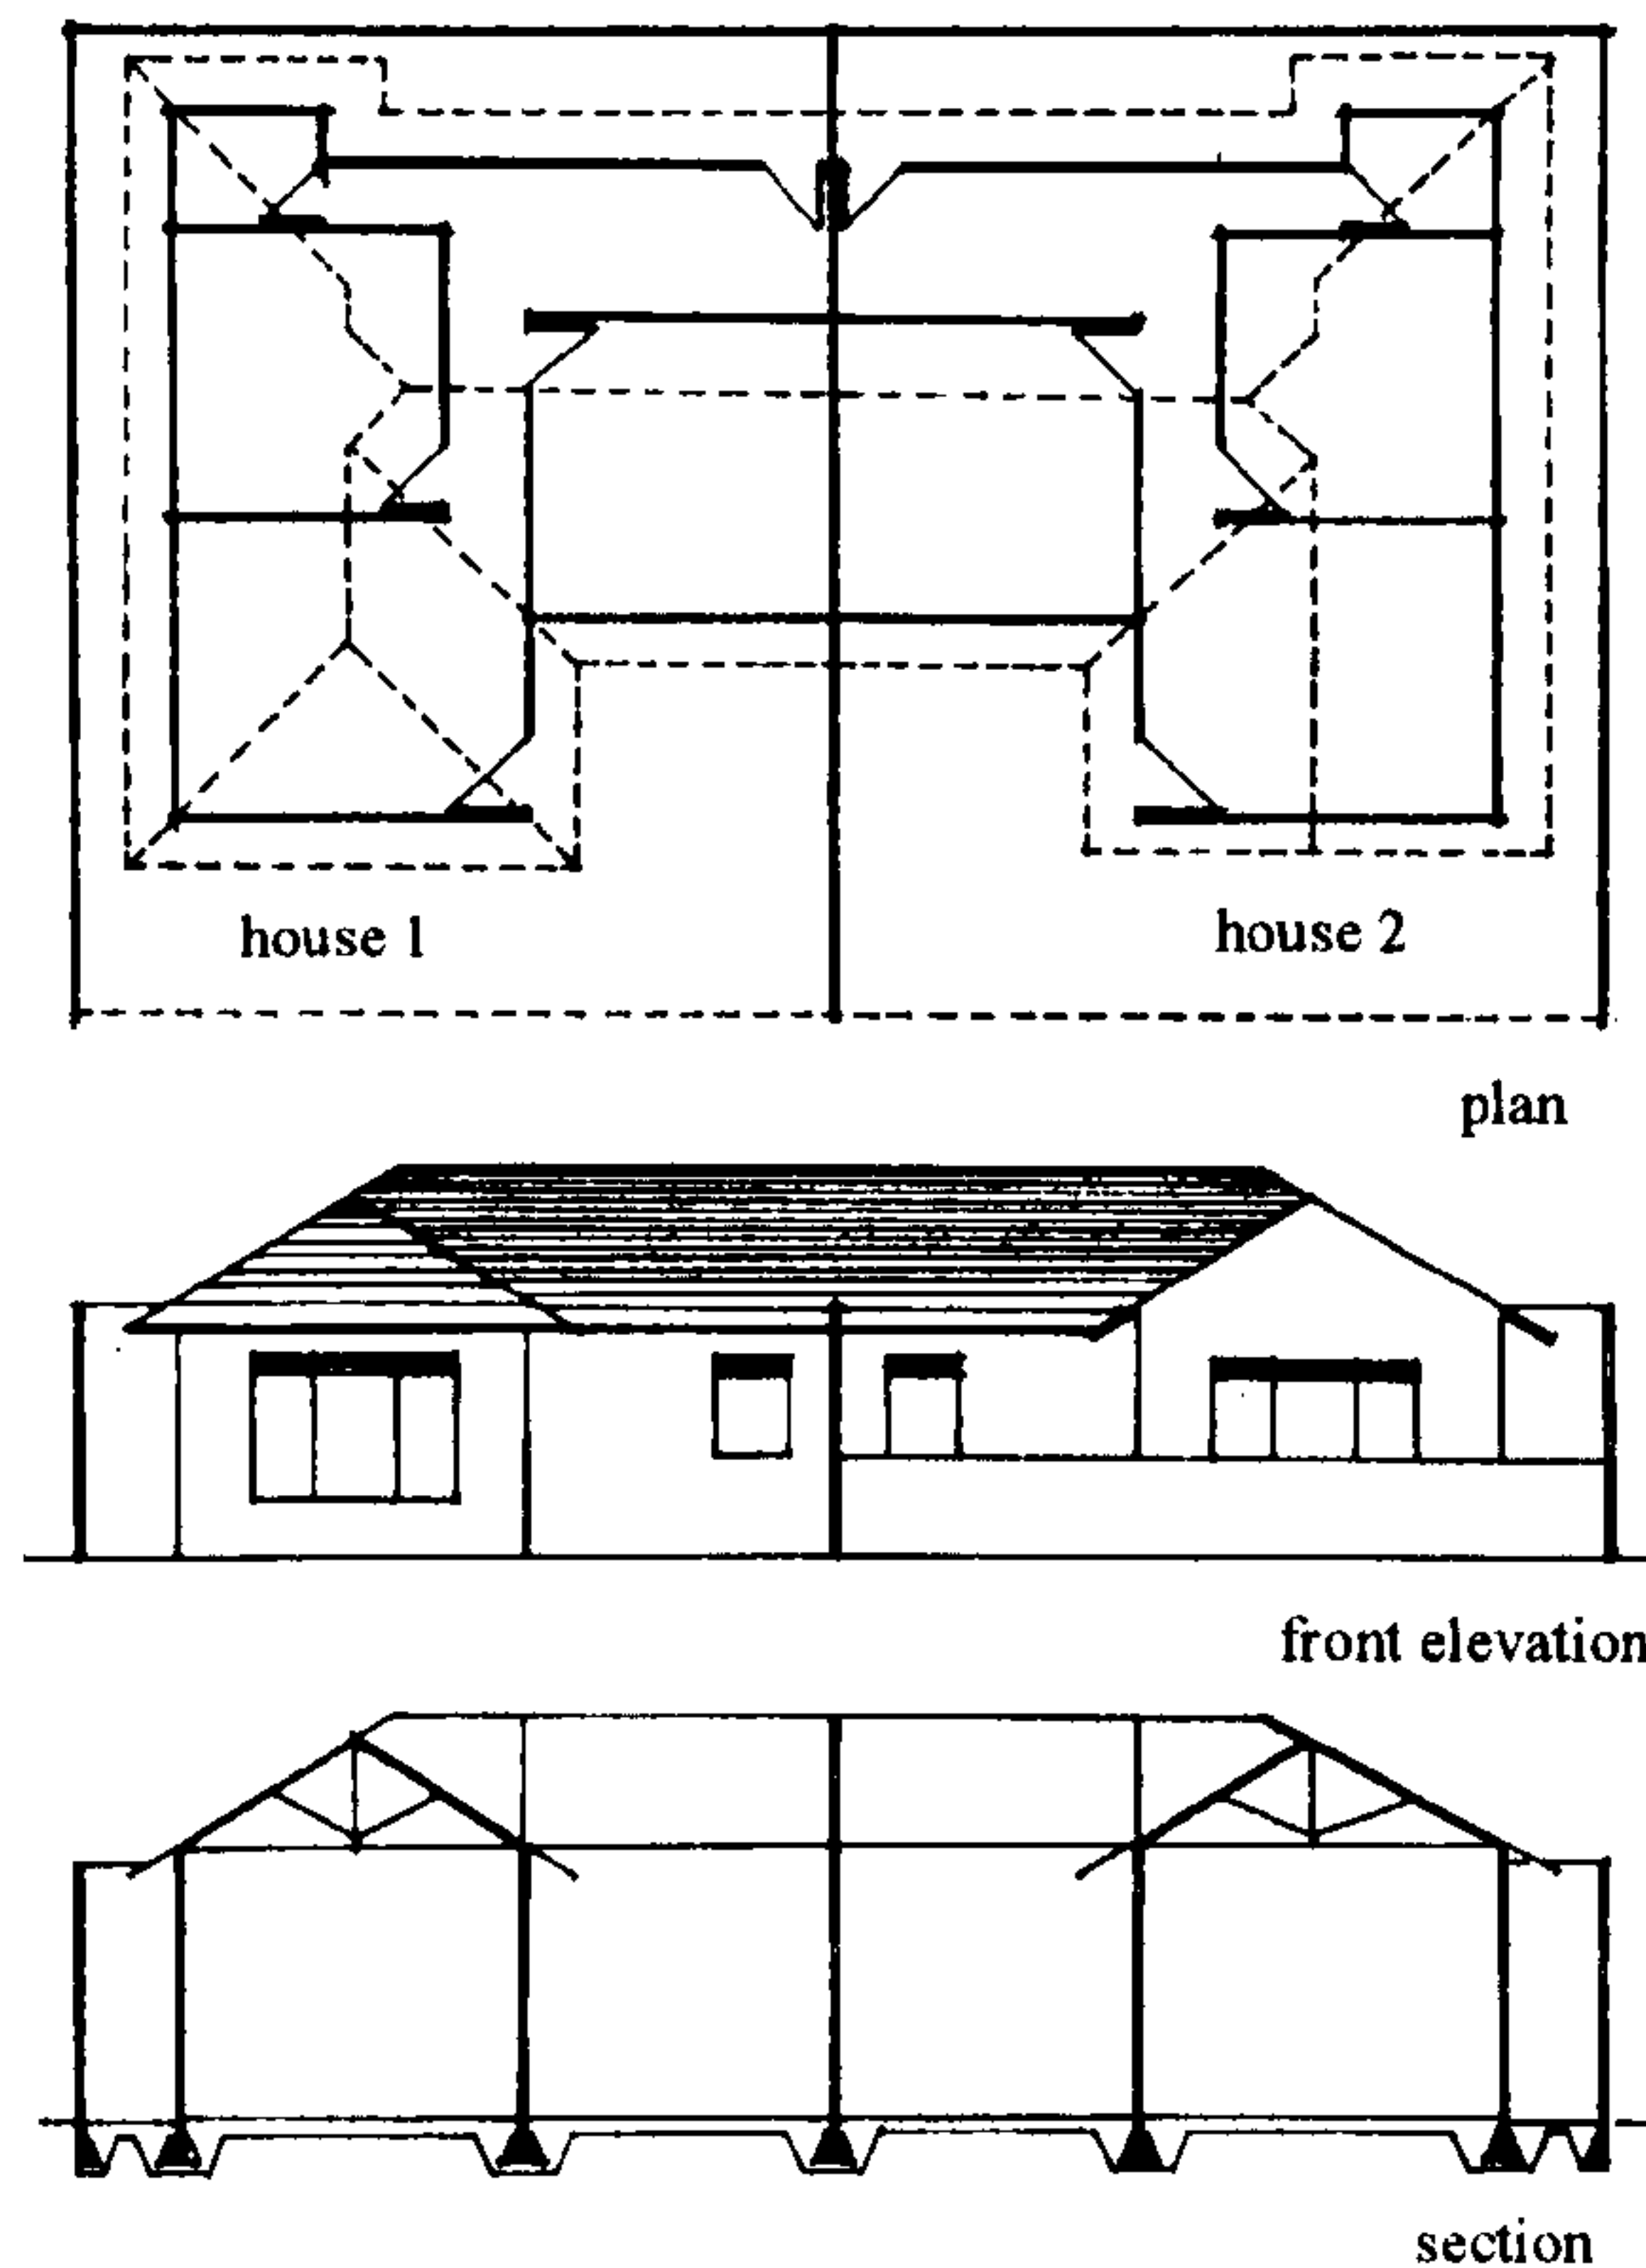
Common Indonesian low cost housing: plan, elevation, and section
